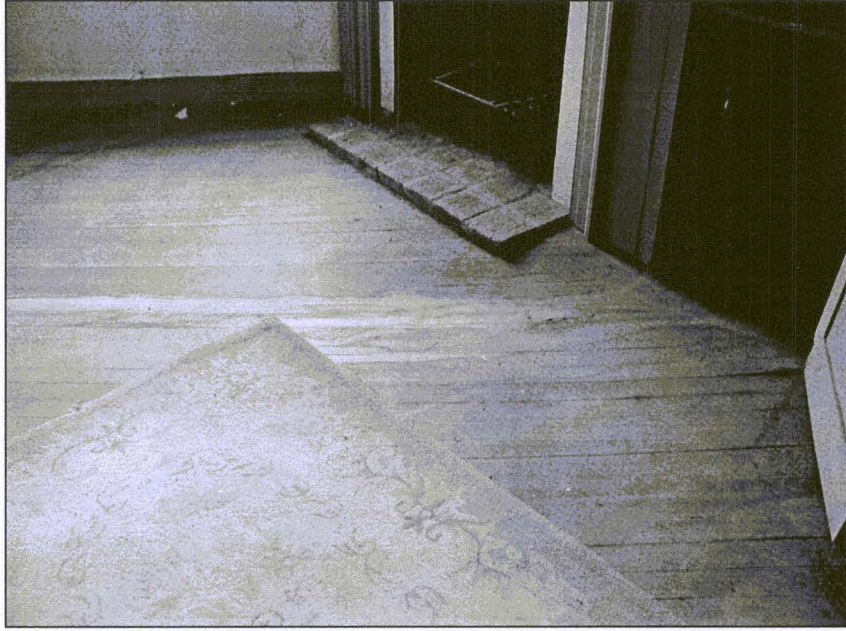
Detail of water damage to floor, Period 1, second floor.
